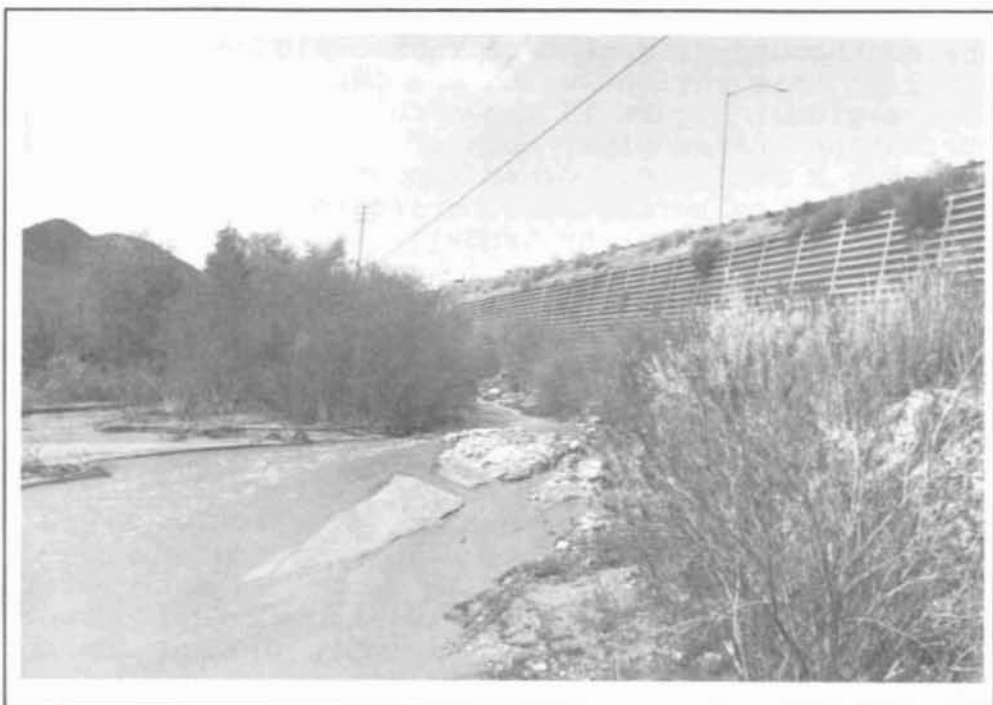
Surface Water Conditions Near The Toe Of The I-15S Retaining Crib Wall
